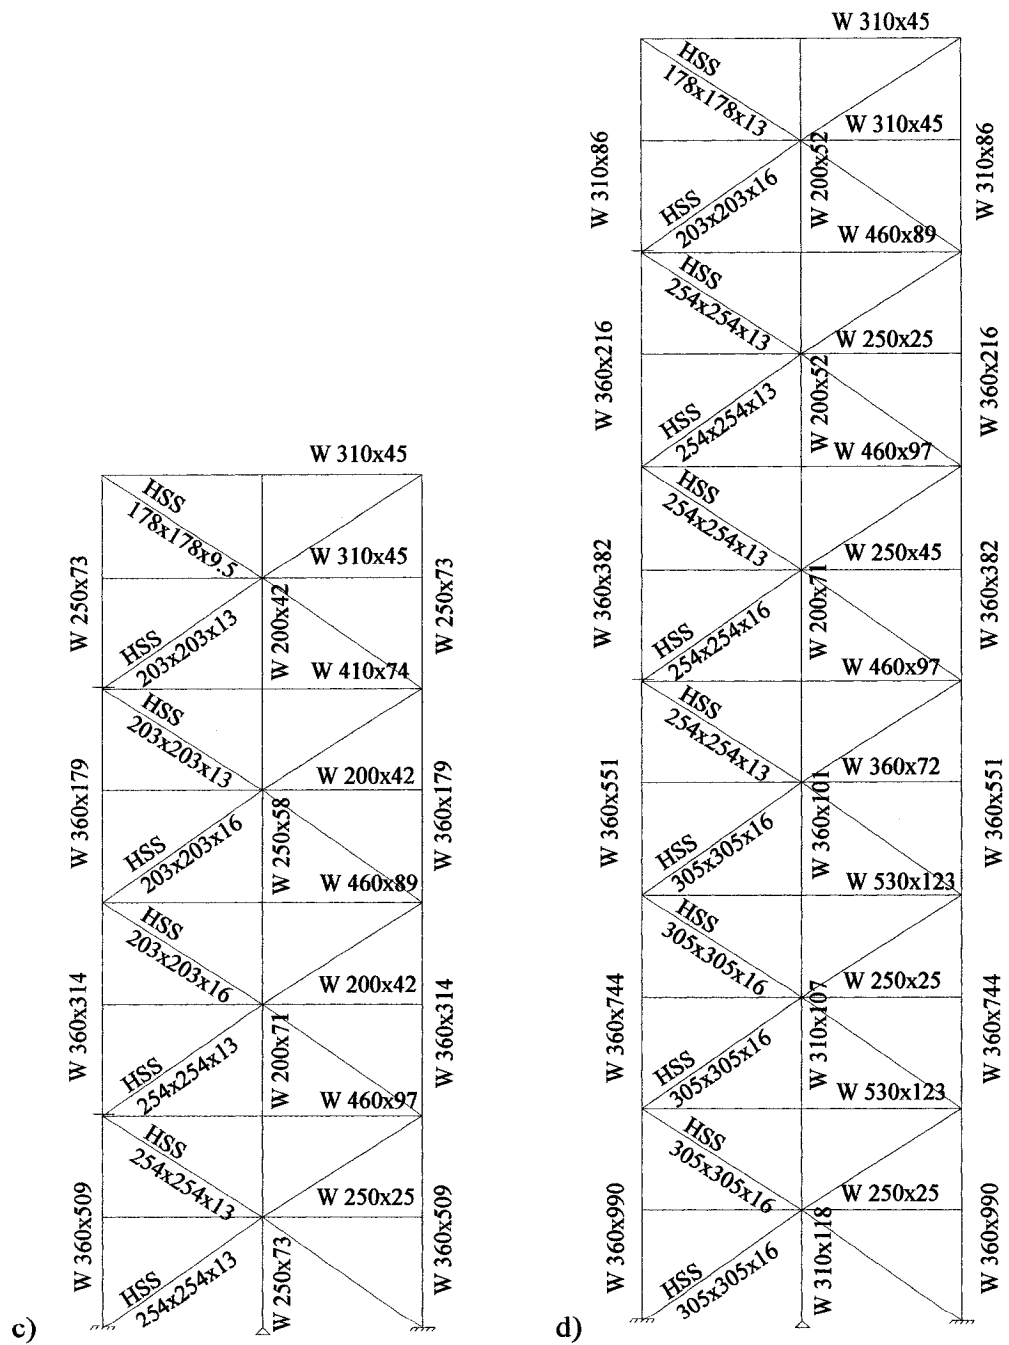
(cont'd) Brace, beam and column sections for the studied buildings;
